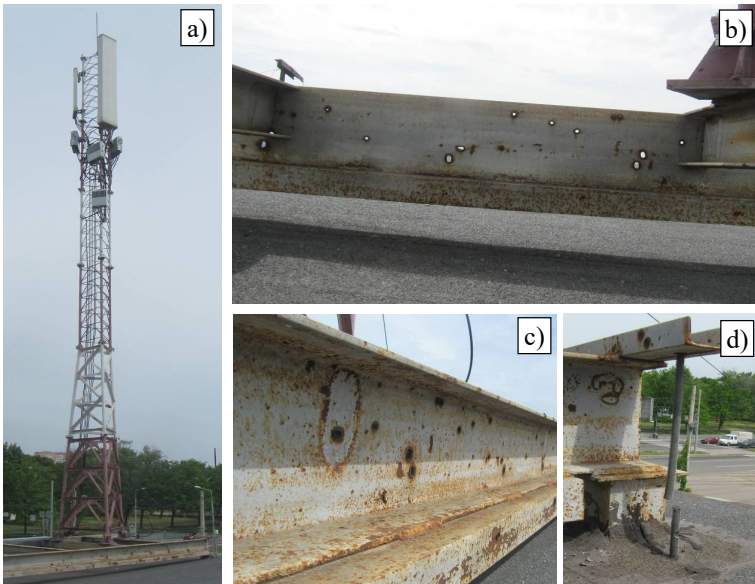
Damage to a tower with a height of $H = 12$ m on the roof of a one-story administrative building:
